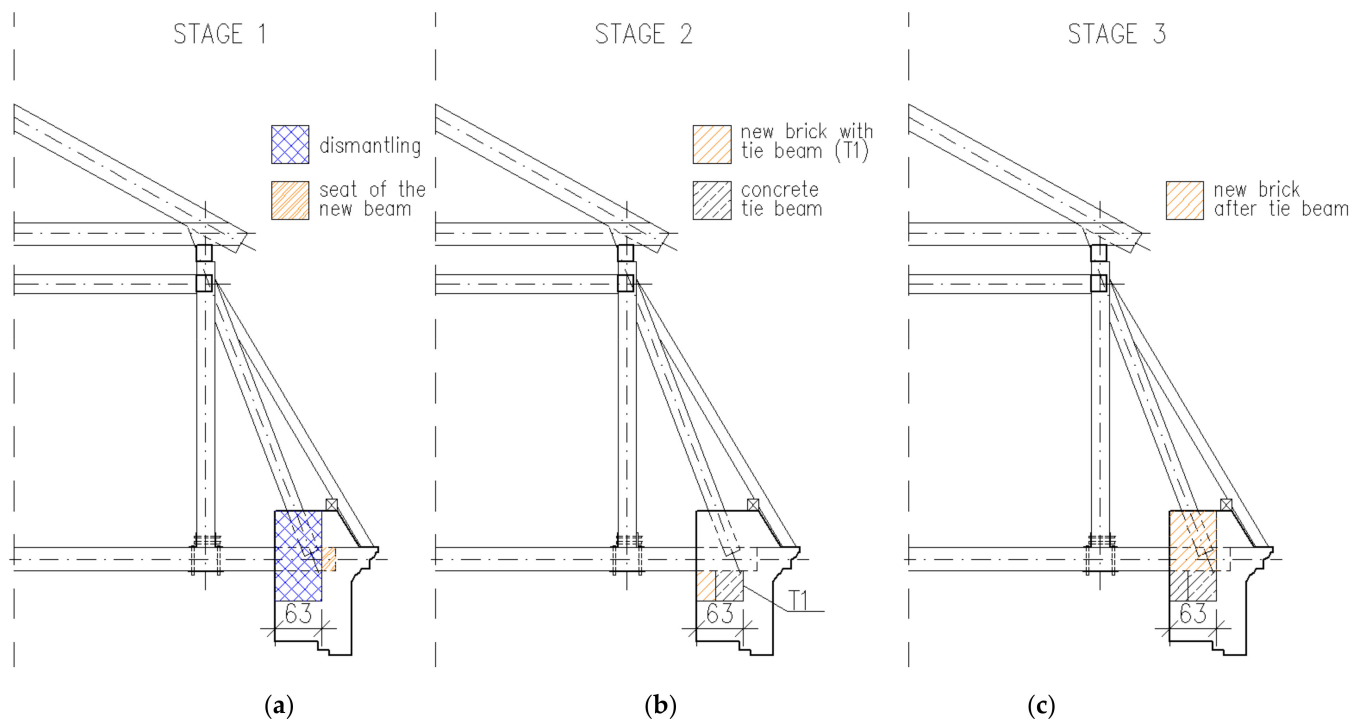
The design stages of a steel frame for the new roof structure: (a) stage 1—dismantling of part of the cornice masonry; (b) stage 2—constructing the tie beam, laying additional bricks to the wall and placing steel girders; (c) stage 3—constructing the wall between steel girders.
